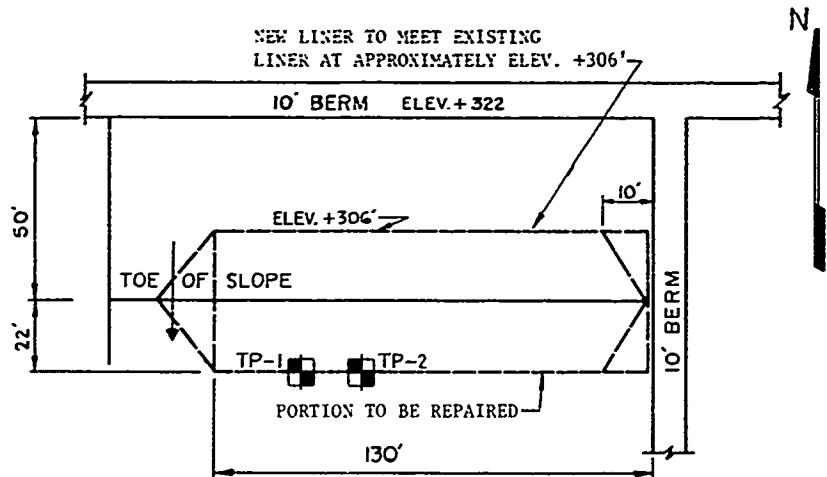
PLAN VIEW OF THE CENTRAL PORTION OF THE NORTH SLOPE SHOWING CONDITIONS AND THE EXTENT OF REMEDIAL WORK TO BE DONE.
